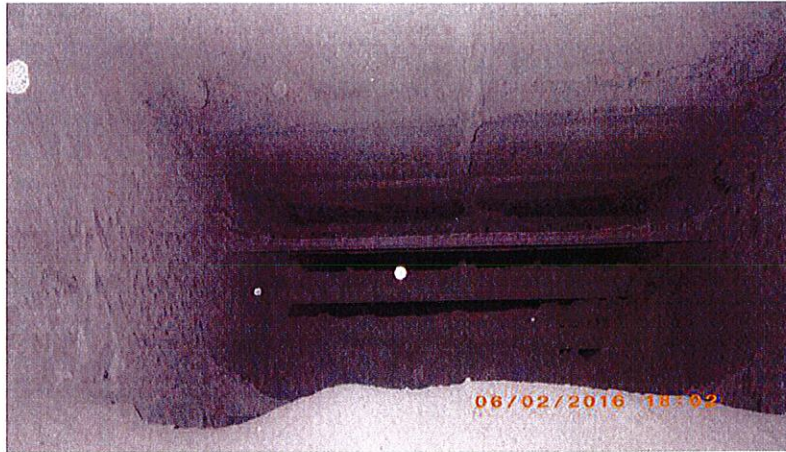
Inlet To Baghouse Inlet Duct - Baffle Screens at Far End Plugged (as found)
